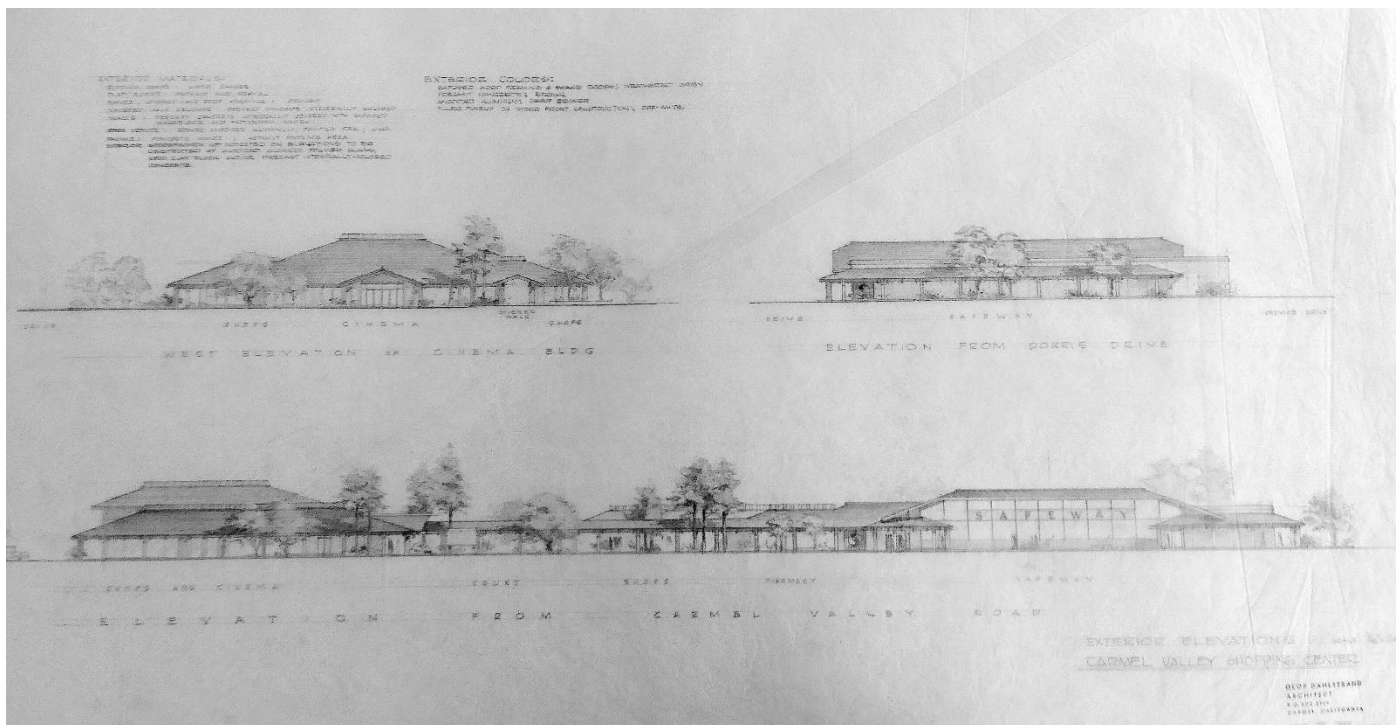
June 1965 elevations by Olof Dahlstrand of the proposed Mid Valley Shopping Center Buildings A and C. Source: CED.
